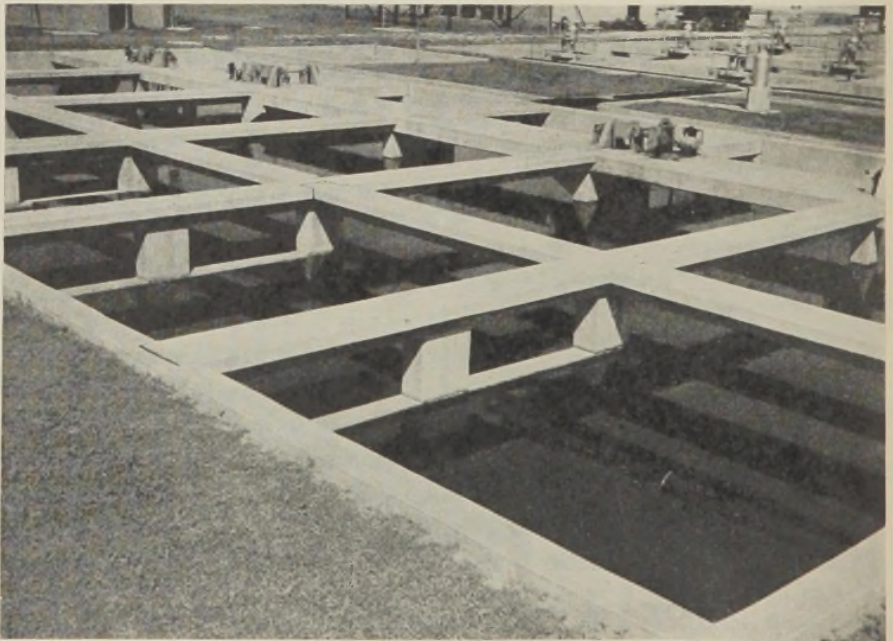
Final settling tank at Main Plant, Camp Claiborne, La.
